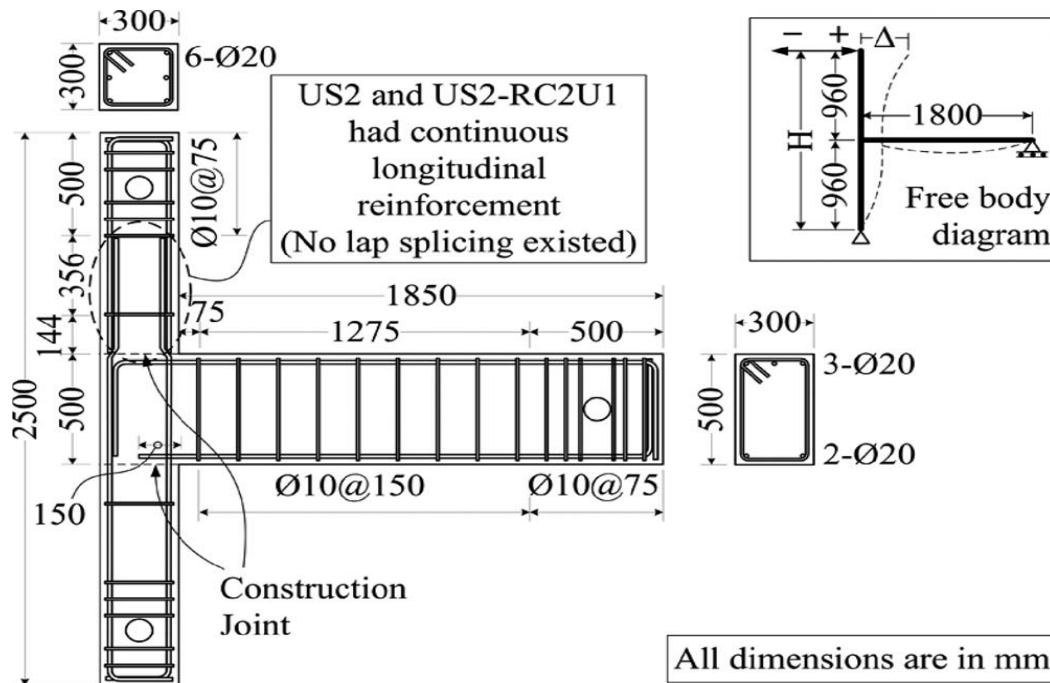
Reinforcement details and dimensions [Parvin, Altay et al. 2009]
